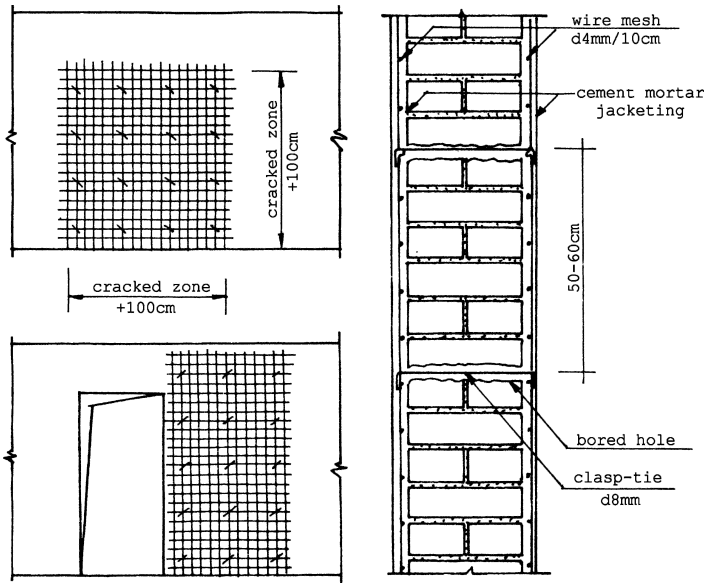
Reinforced concrete jacketing of the existing masonry walls (UNDP, Vol. 5)
